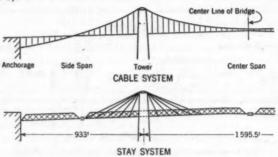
CABLE AND STAY SYSTEMS, BROOKLYN BRIDGE
